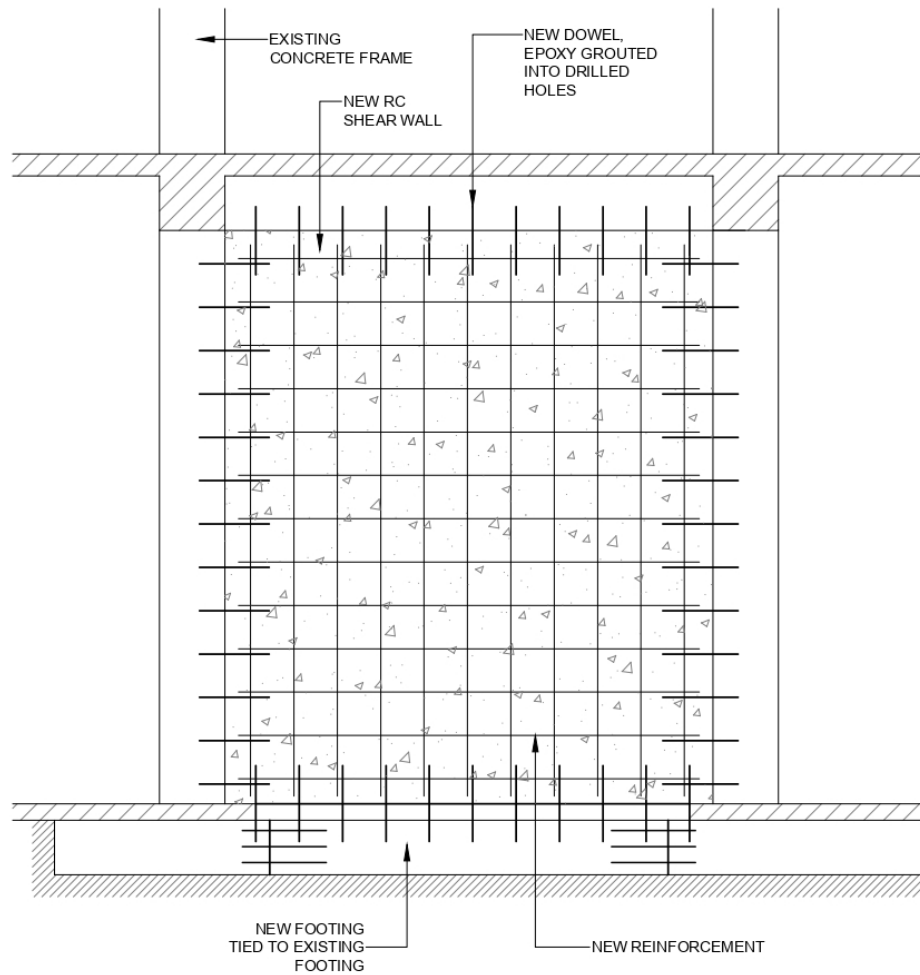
Shear Wall Re-inforcement detail (Ref. IS 15988:2013)
